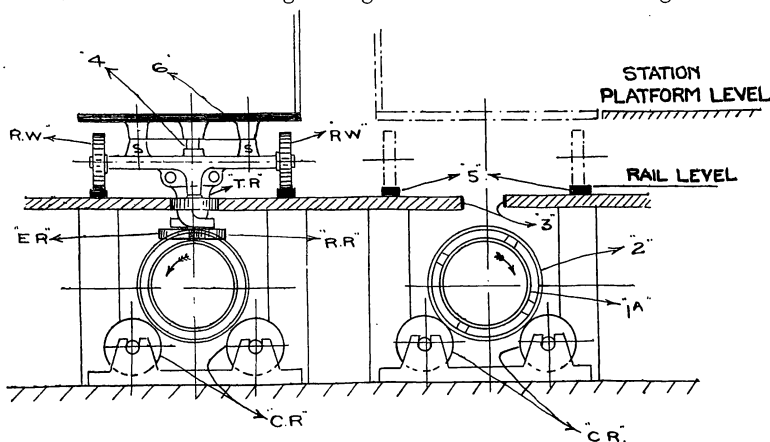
A.—DIAGRAMMATIC CROSS-SECTIONAL ELEVATION OF ADKINS-LEWIS SYSTEM.
